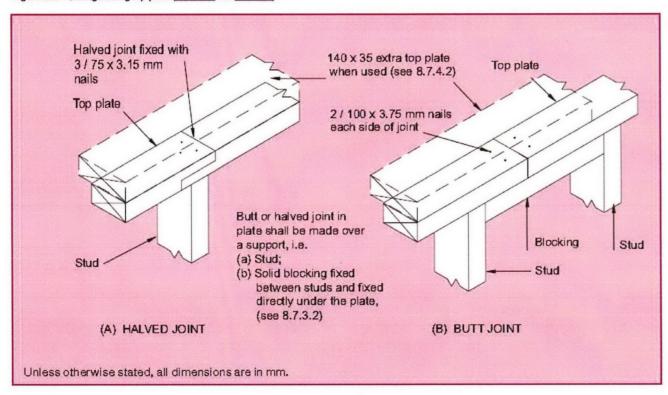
Connecting top plates - Walls not containing bracing (see 8.7.3.2)
